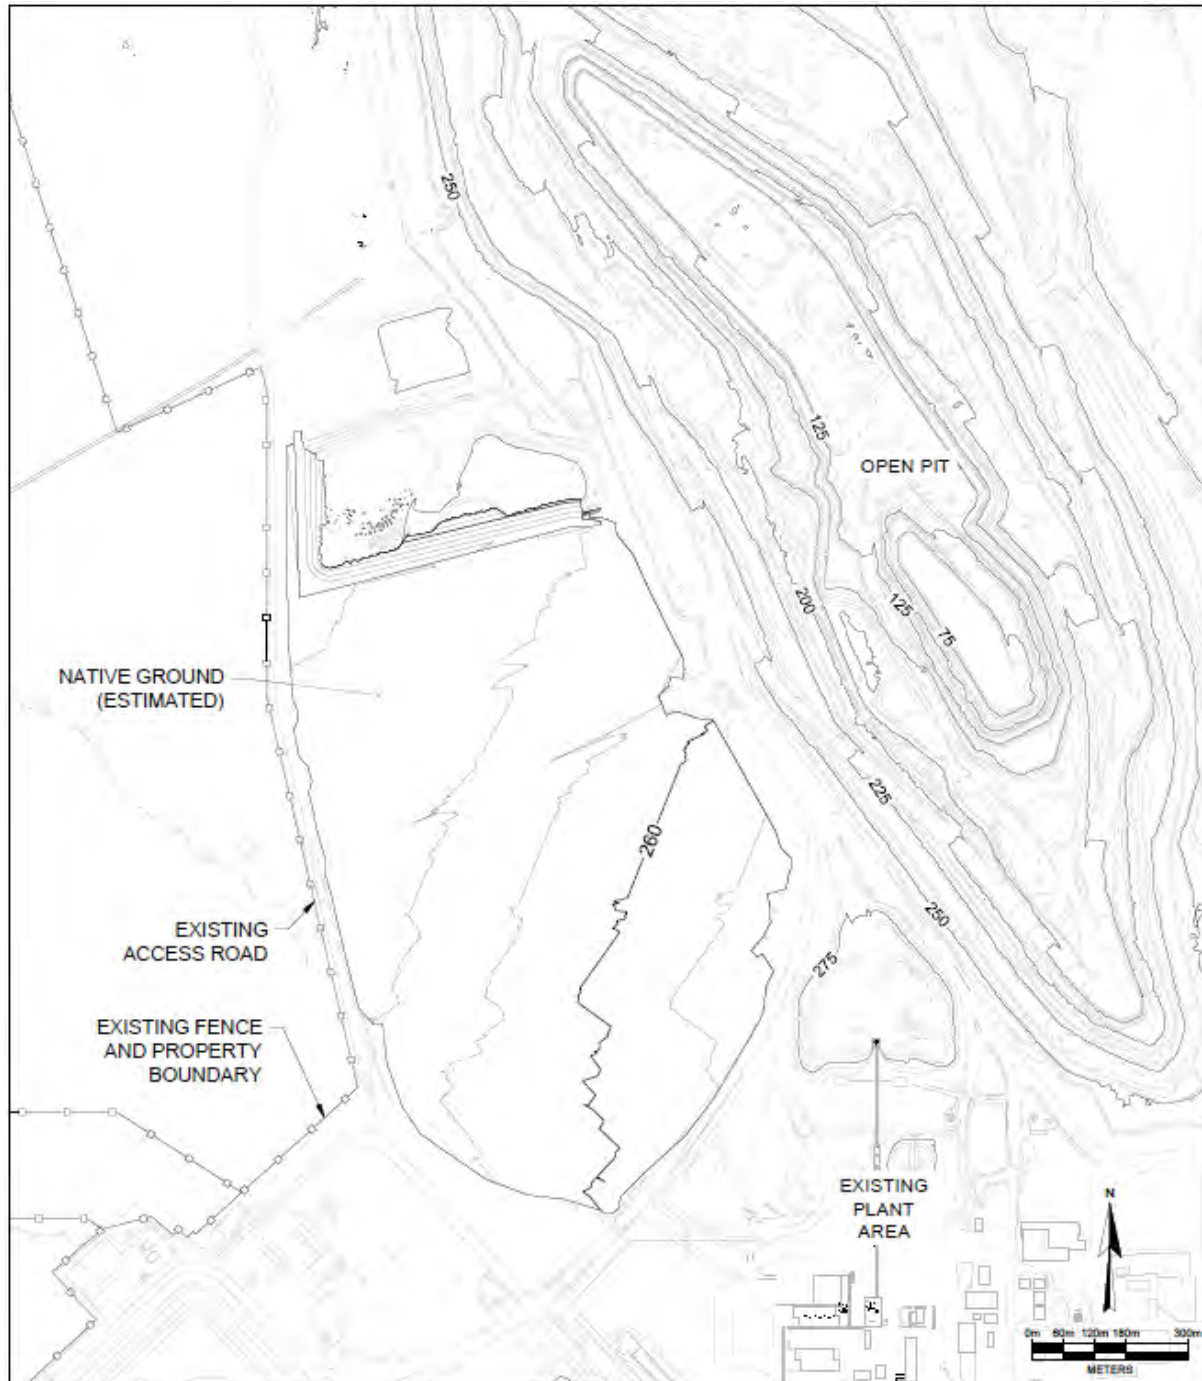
HEAP LEACH PAD SITE LAYOUT
